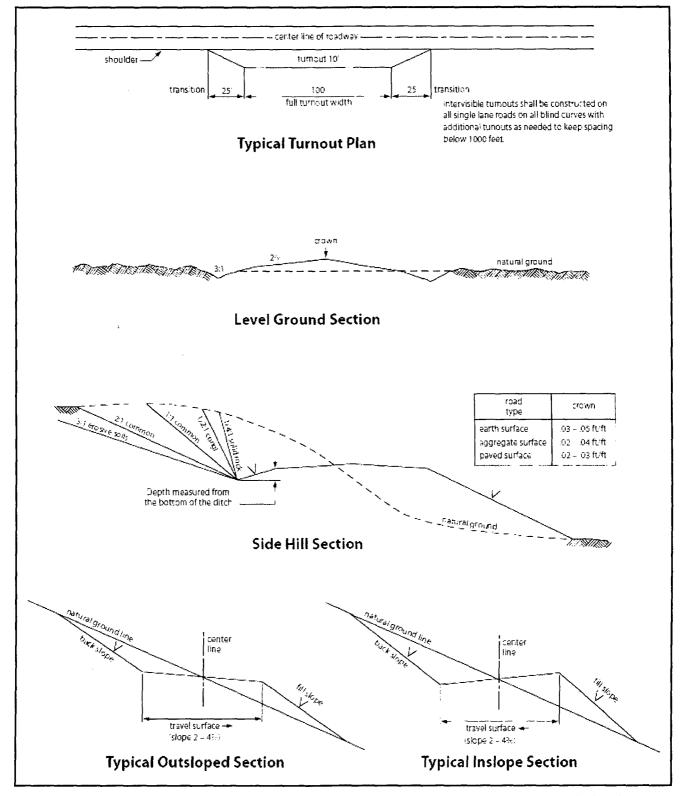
Cross-sections and plans for typical road sections representative of BLM resource or FS local and higher-class roads.
